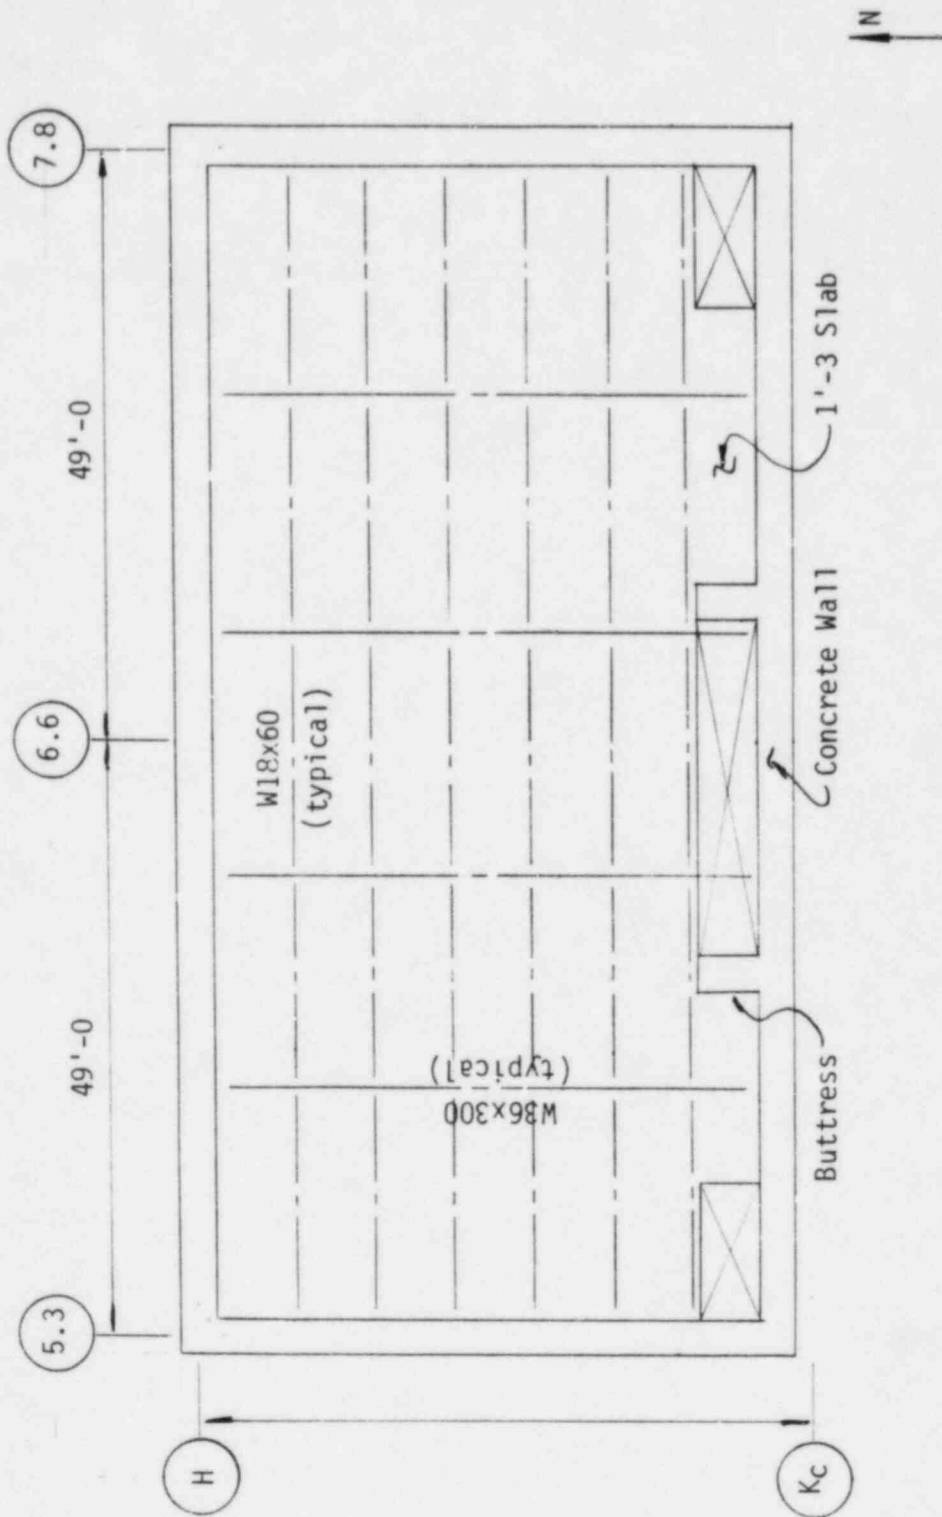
AUXILIARY BUILDING FLOOR AT ELEVATION 685'-0
